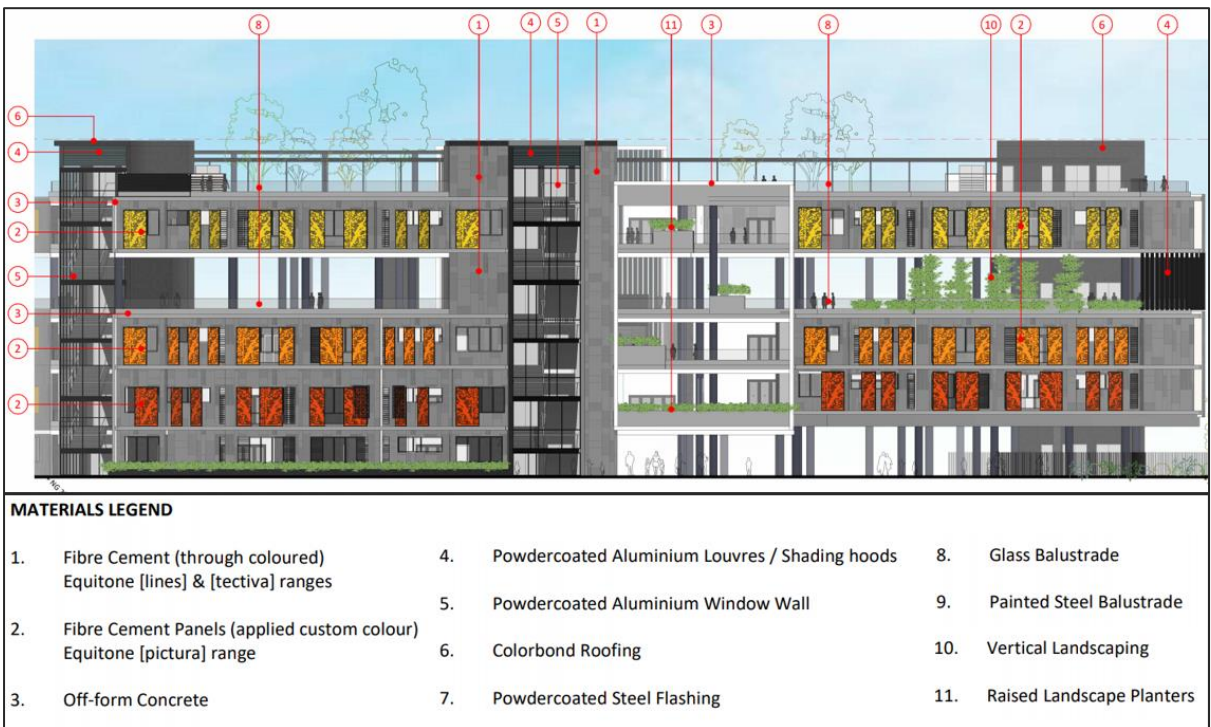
| Proposed primary school building from the west (Source: Applicant's SRtS 2021).
